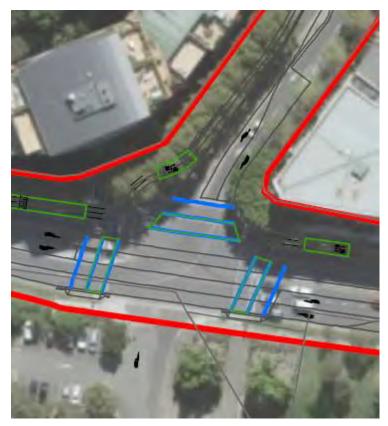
Mitchell Road / Sydney Park Road intersection
